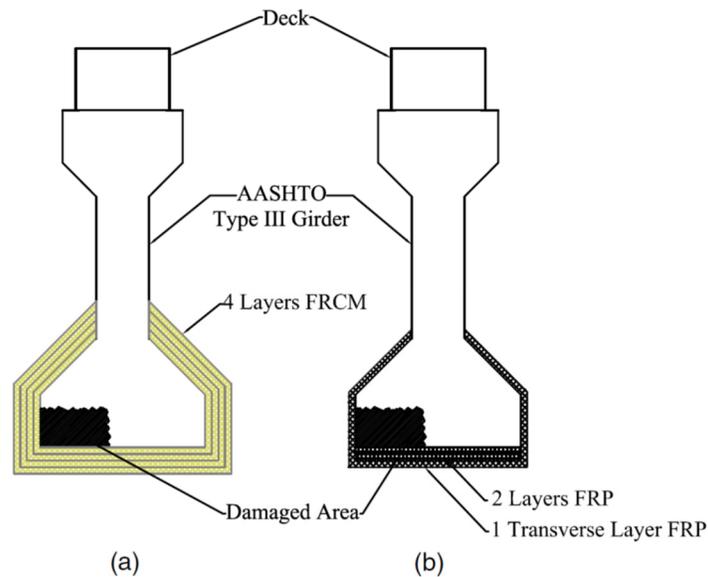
Repair configuration for impact damaged girders using (a) FRCM (b) FRP [18]
